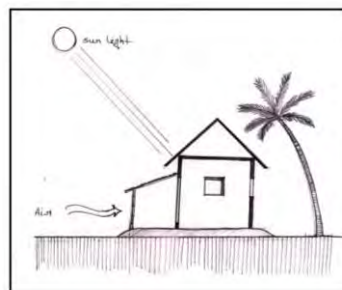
Light and air: Figure ground section shows South should be free to allow light and air (ventilation).
